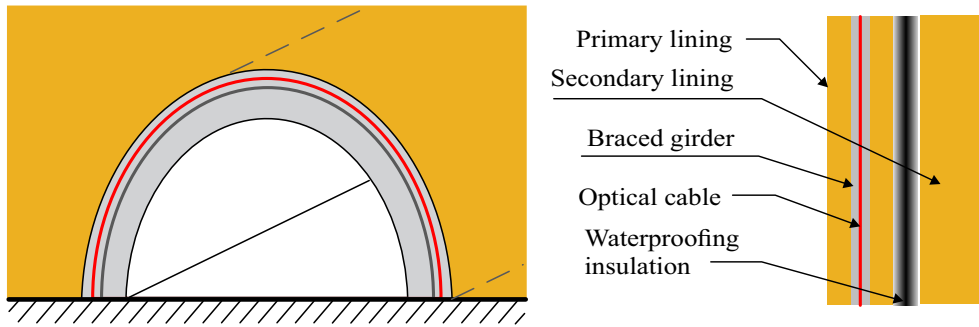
The tunnel in Žilina: (a) – tunnel structure, (b) – detail of wall
